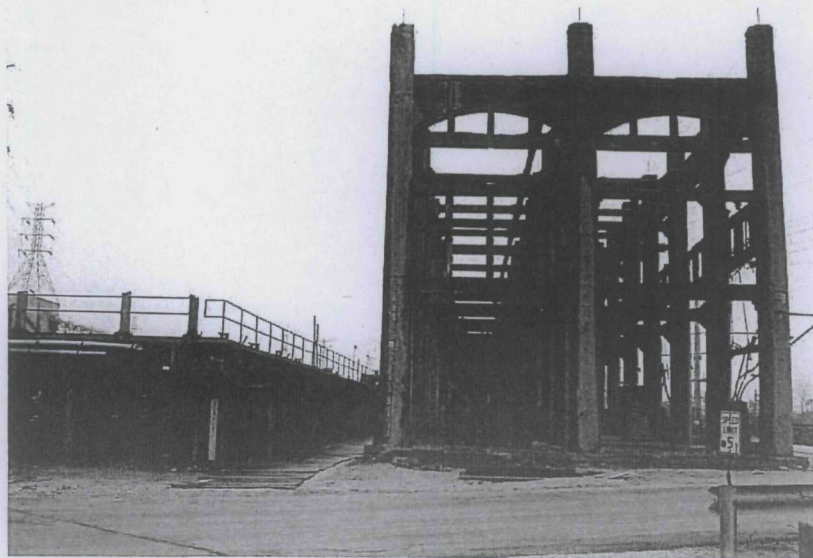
View of obsolete ComEd 38 and 66 KV buildings along the southern side of the site.
